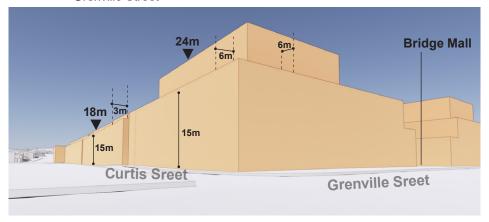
Sub-Area 1: Bridge Mall Gateway view from corner of Curtis Street and Grenville Street
